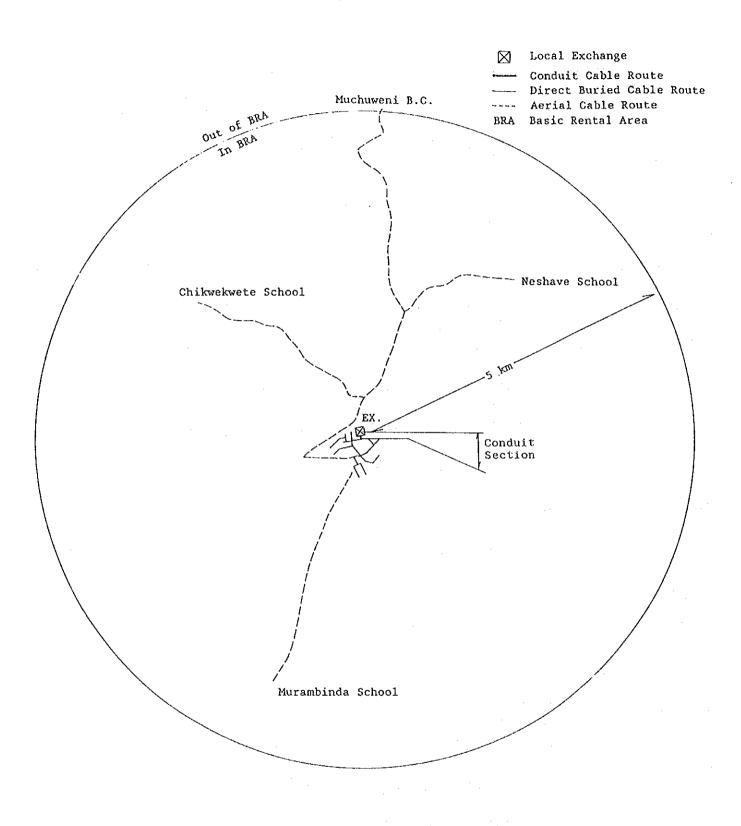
(3/6) Local Cable Distribution Plan in BRA (Murambinda Exchange)
